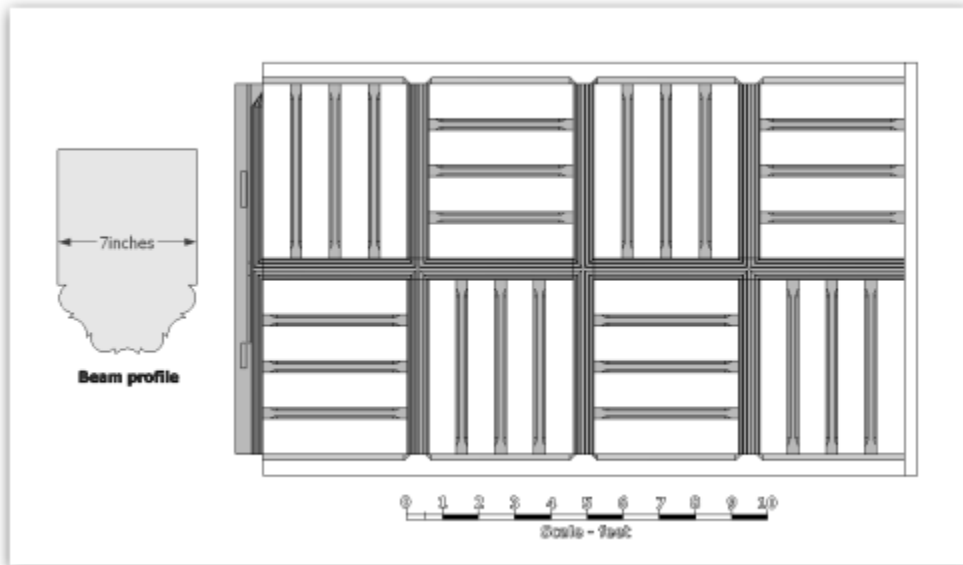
The counterchange ceiling and beam profile in Mortimer Cottage
